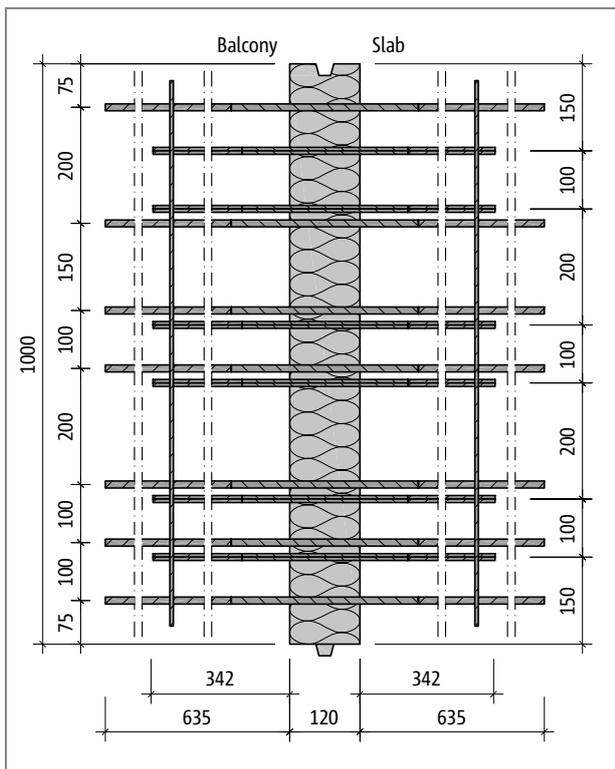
Schöck Isokorb® XT type D-MM3-VV1: Plan view
